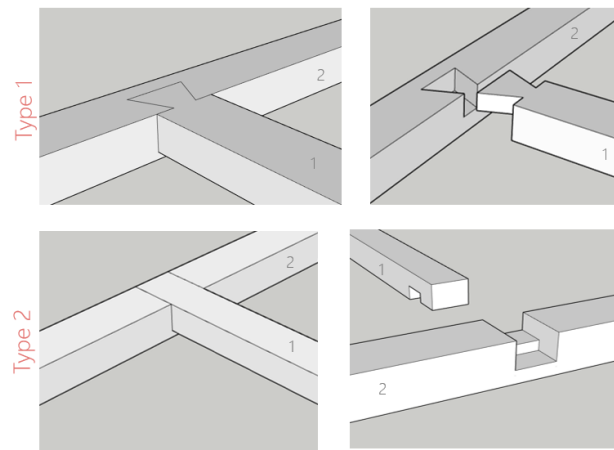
Connection Type 1 (dovetail joint) and Type 2 (simple lap joint)
